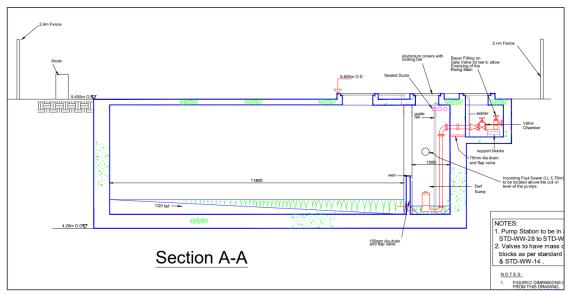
Pumping Station Detail - extract of drawing 10690-2116 Rev P03
